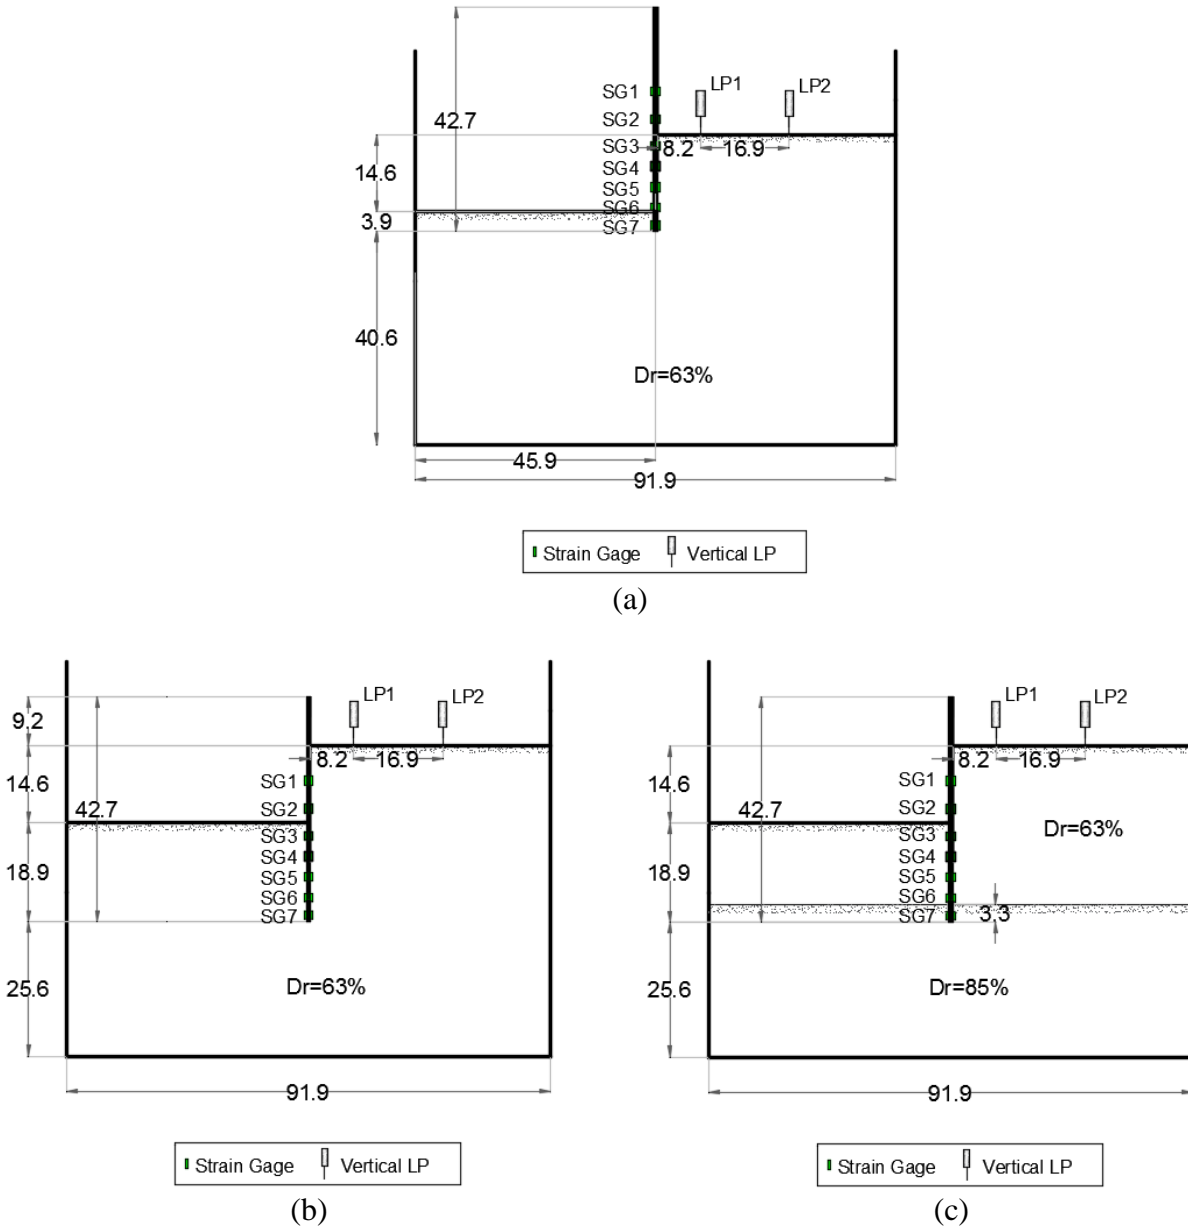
Cross-section of the centrifuge model for tests with $D/H=1.3$: (a) before sheet pile wall insertion; (b) homogenous sand (PR1); and (c) two layers of sand (PR2).
